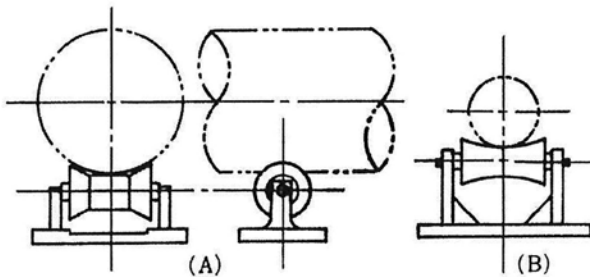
Guide anchor (sliding support platform)¹⁰
